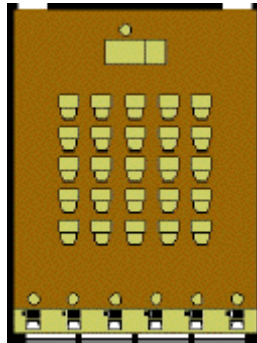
Floor plan of the Math classroom (ref: Lab Plan)
